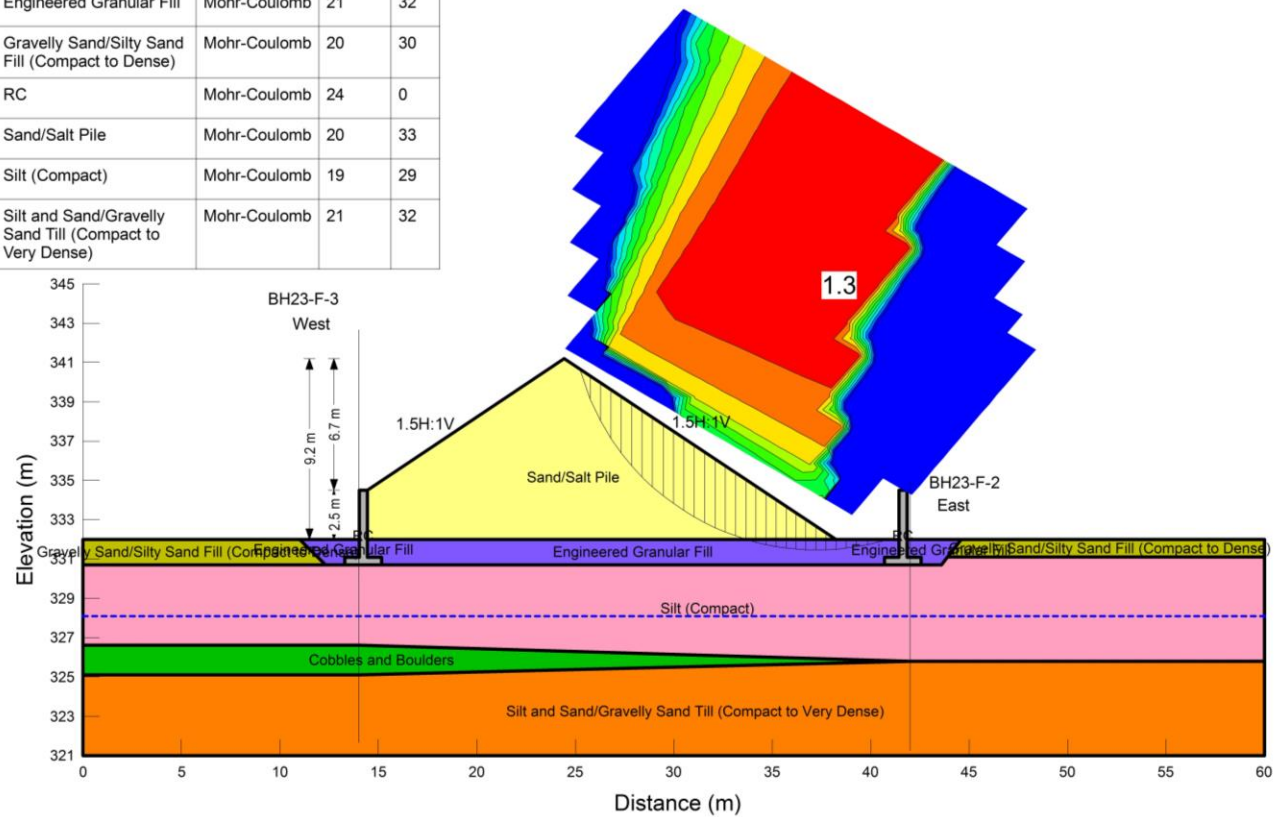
Slope stability analysis of new material storage building – E-W section, south side wall – drained static analysis
